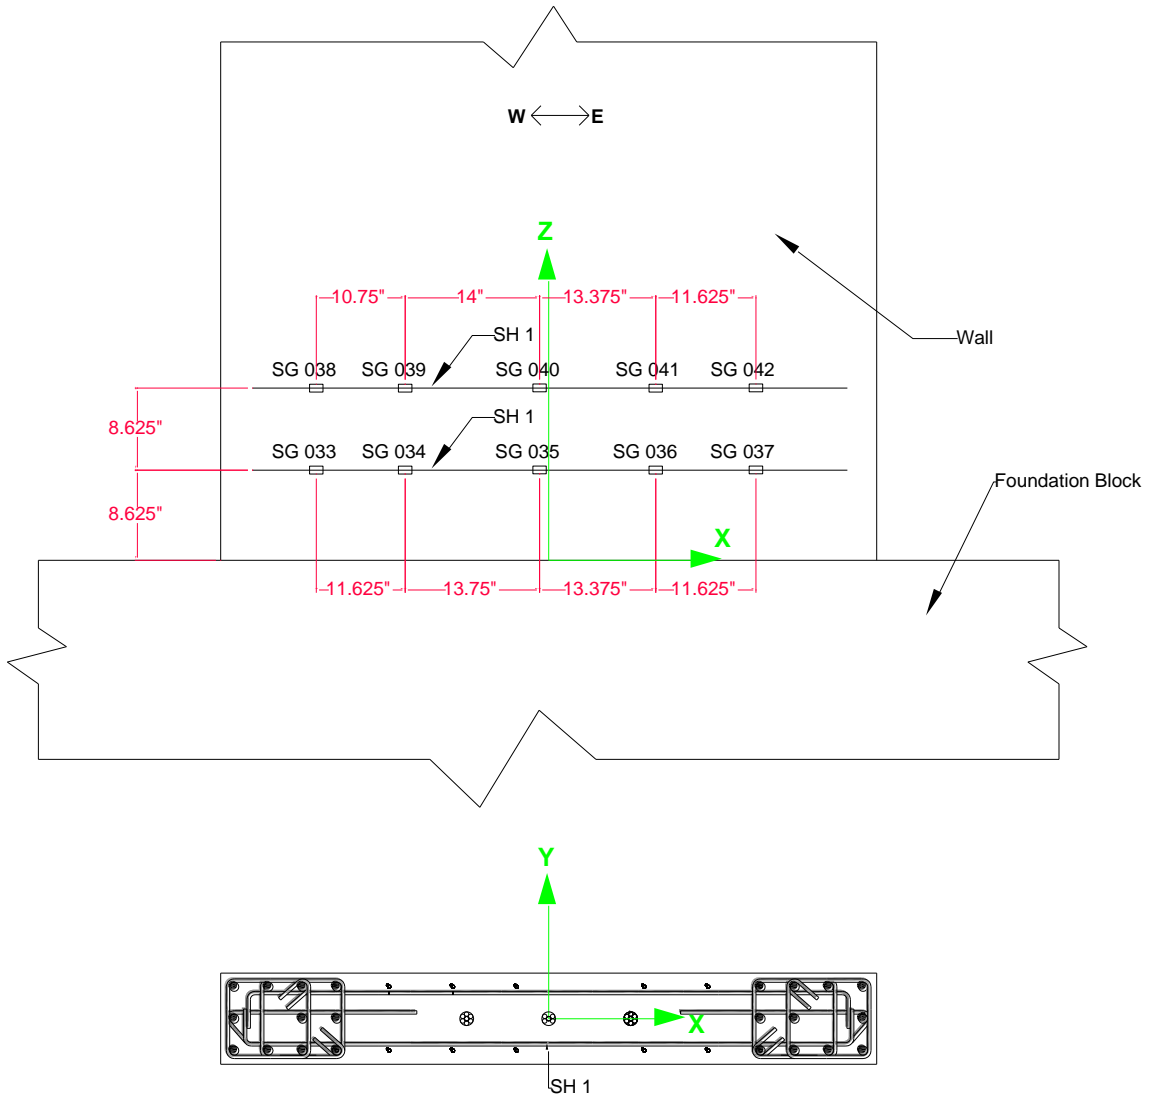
Strain gauges on web transverse steel reinforcement on Wall 3
